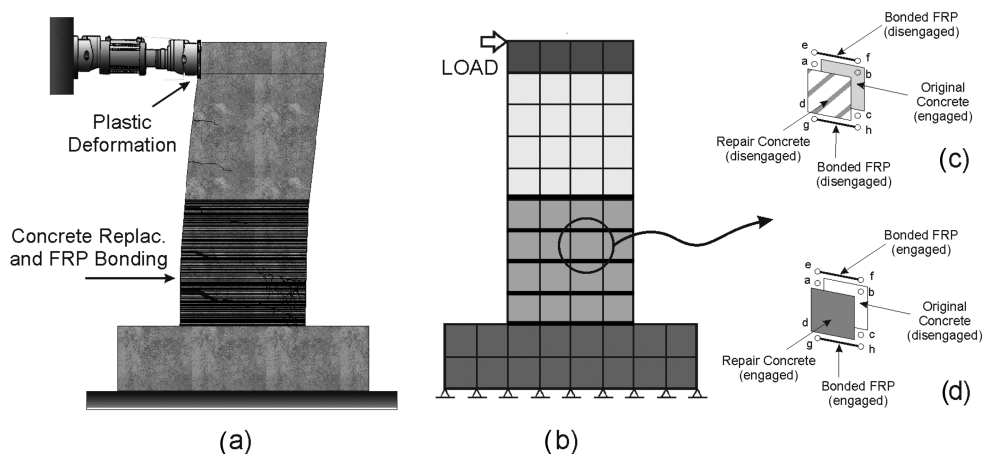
Modelling of repaired/retrofitted shear wall: (a) specimen, (b) FE Model, (c) detail of original wall and (d) detail of repaired/retrofitted wall
